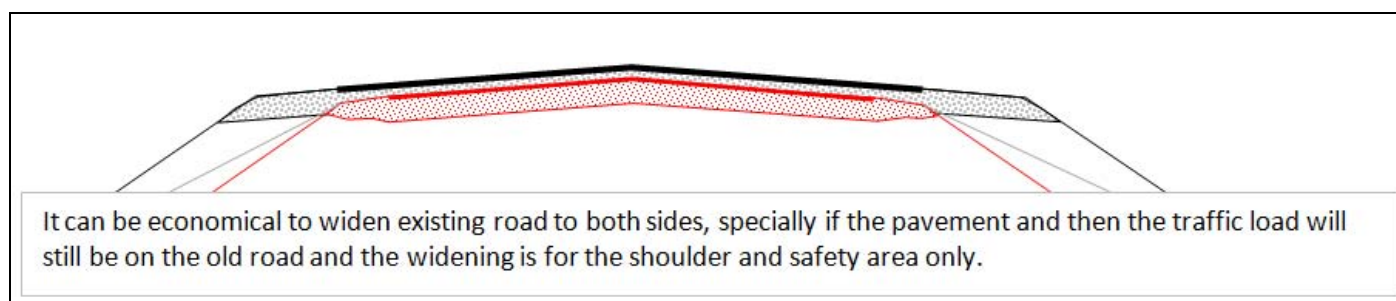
Road widening on both sides of an existing road [Modified from Icelandic road administration 2010]
